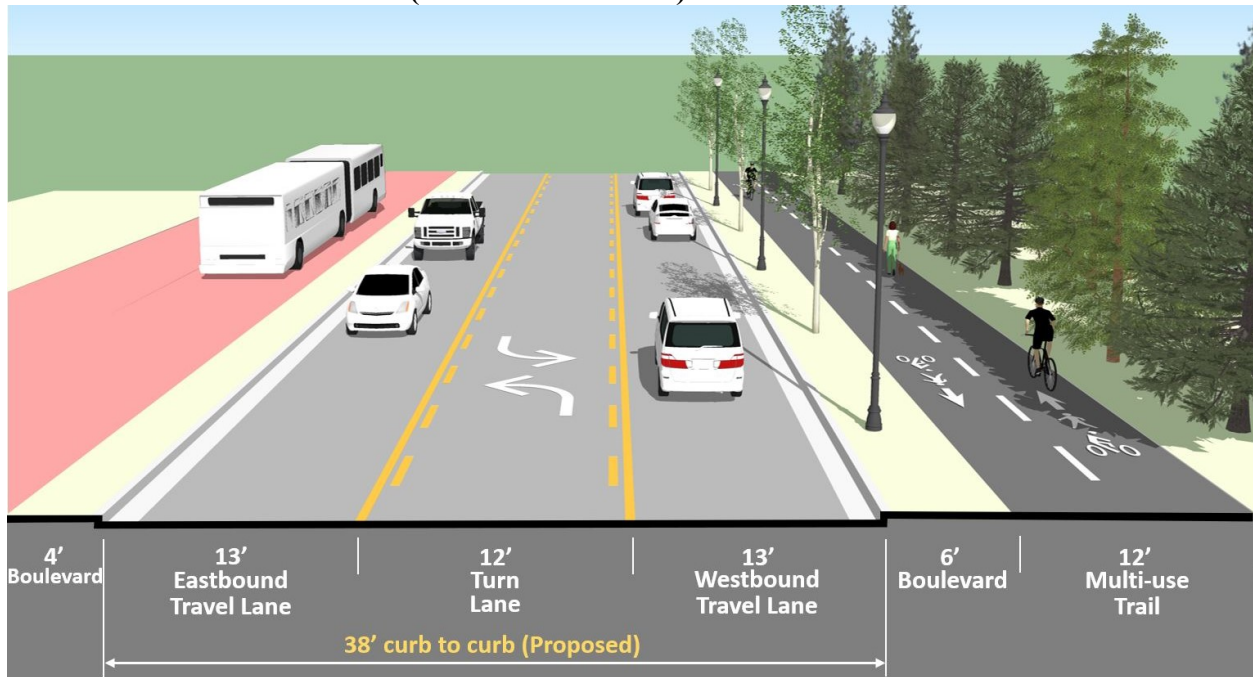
HELMO AVENUE N. (LOOKING NORTH)
